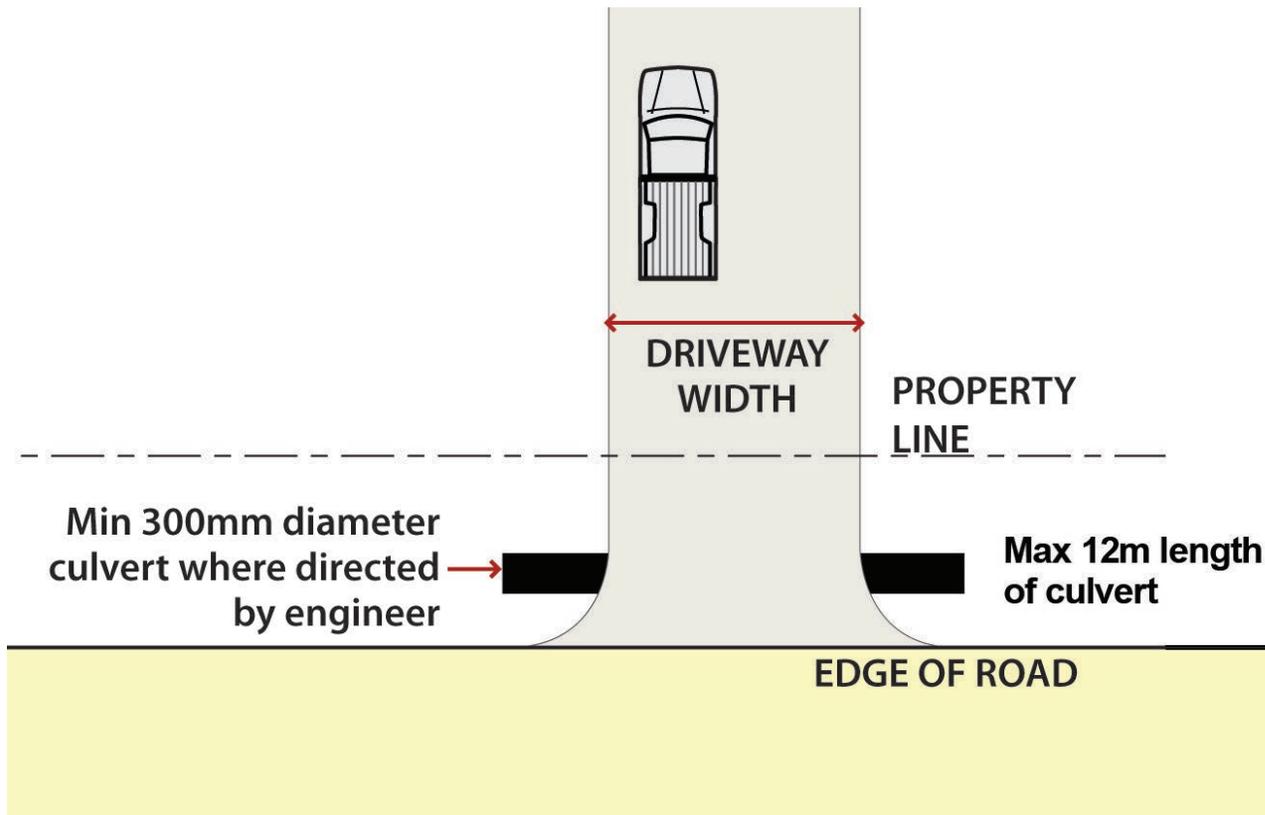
Culverts should be installed under driveways in line with any ditches in the road right-of-way according to engineering specifications.
